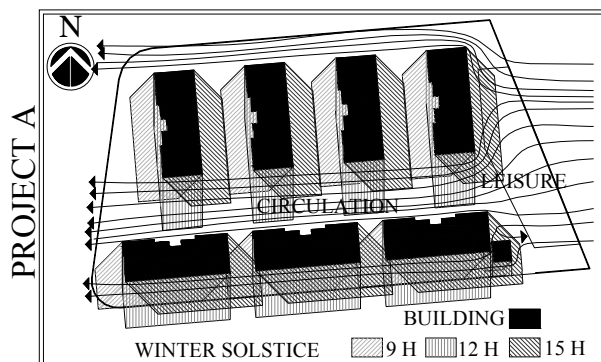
Shading and ventilation in the winter solstice day in house-building A.
